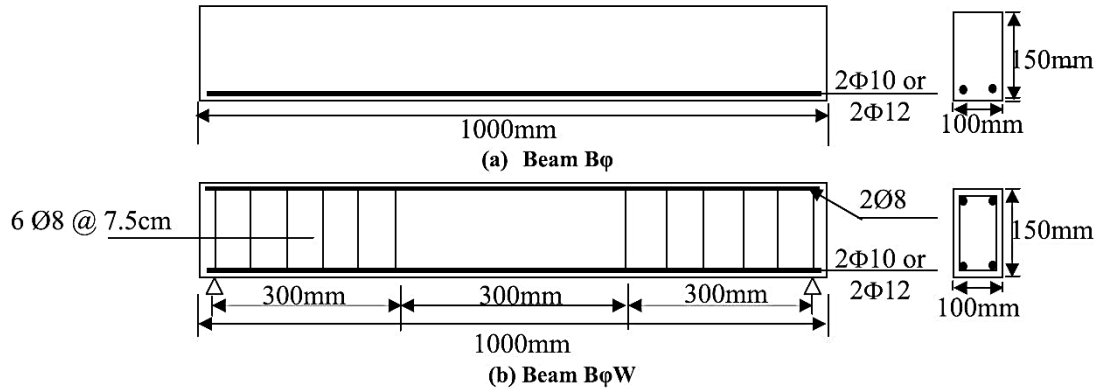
Geometrical and reinforcement details of the tested beams [73].
